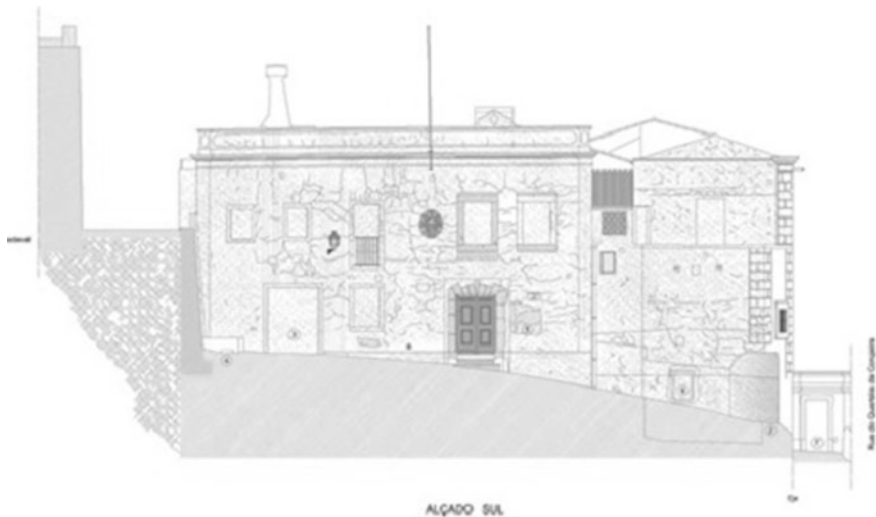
Principal facade (credit of image—AMR—Alberto Martinez Rubio, “*Levantamientos Arquitectónicos*”)
